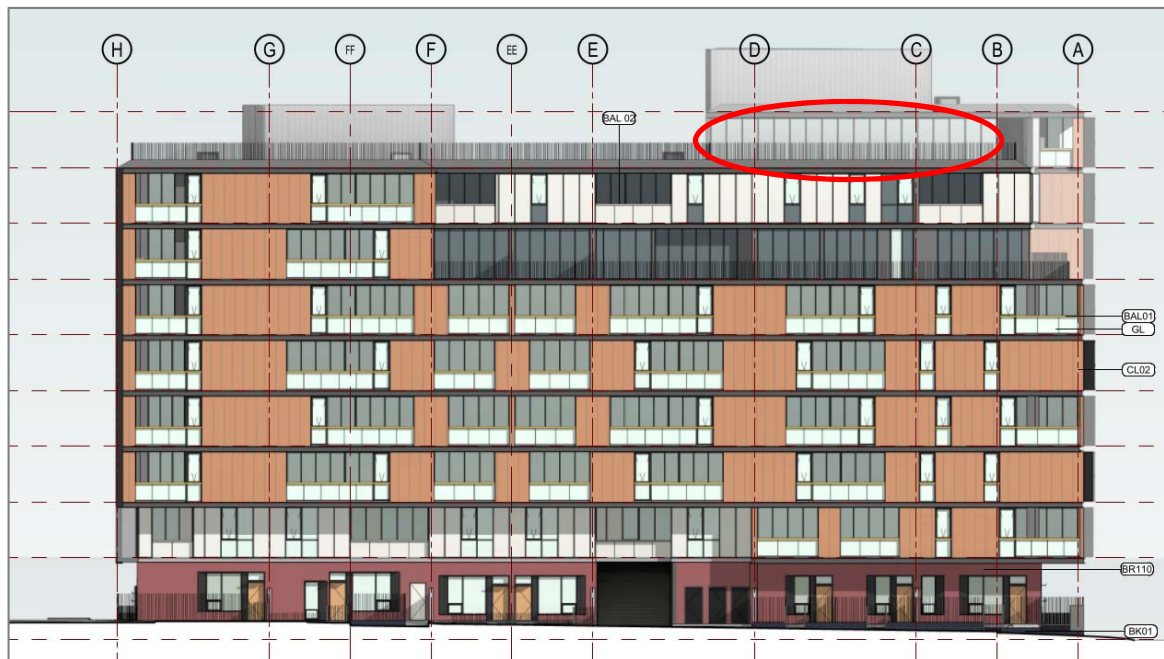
Building B northern (Peters Street) elevation – showing additional
